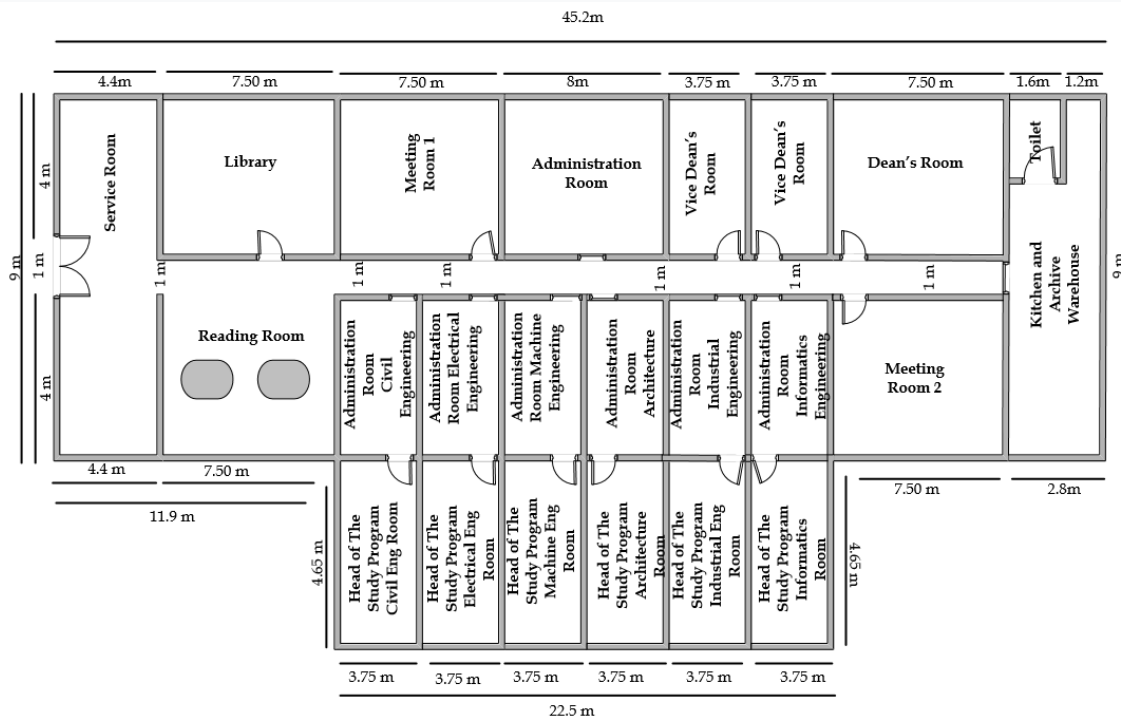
The Layout of the 1st Floor Room of Faculty Engineering, Universitas Medan Area
